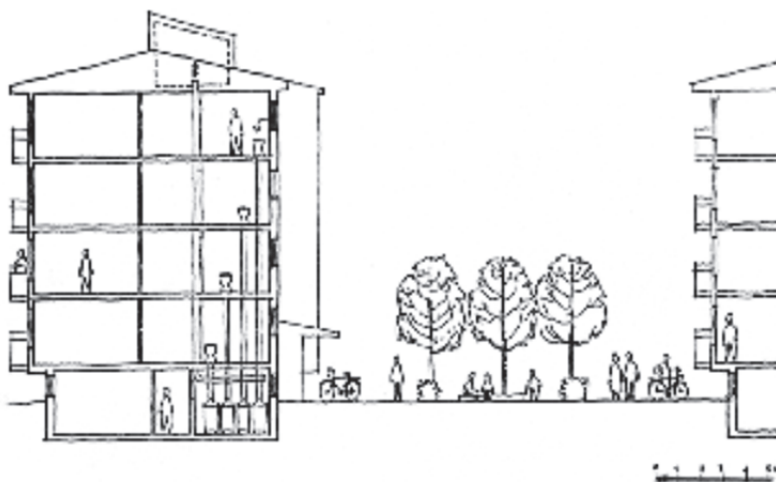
A way to situate dry toilets in apartment building (Winbland 2004).
